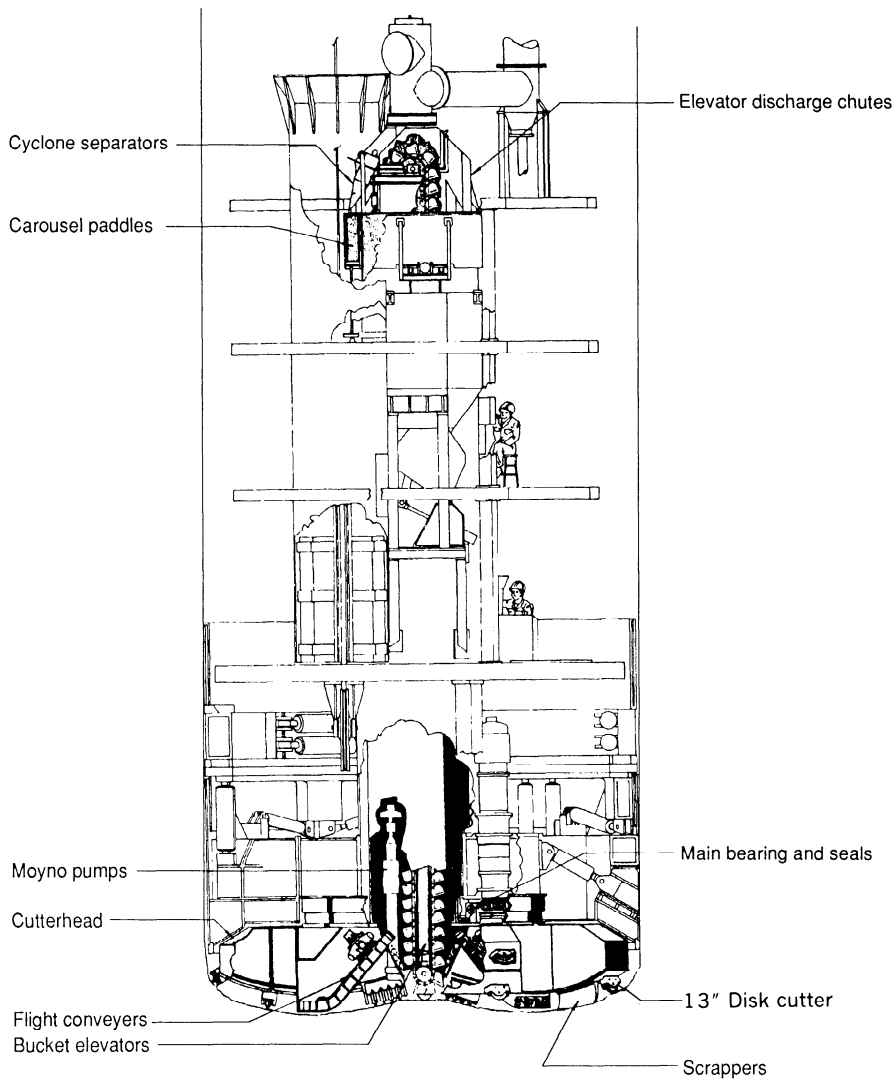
Blind-shaft-borer down-hole equipment (courtesy: Robbins Co., Seattle, WA, Model 2418B-189).
